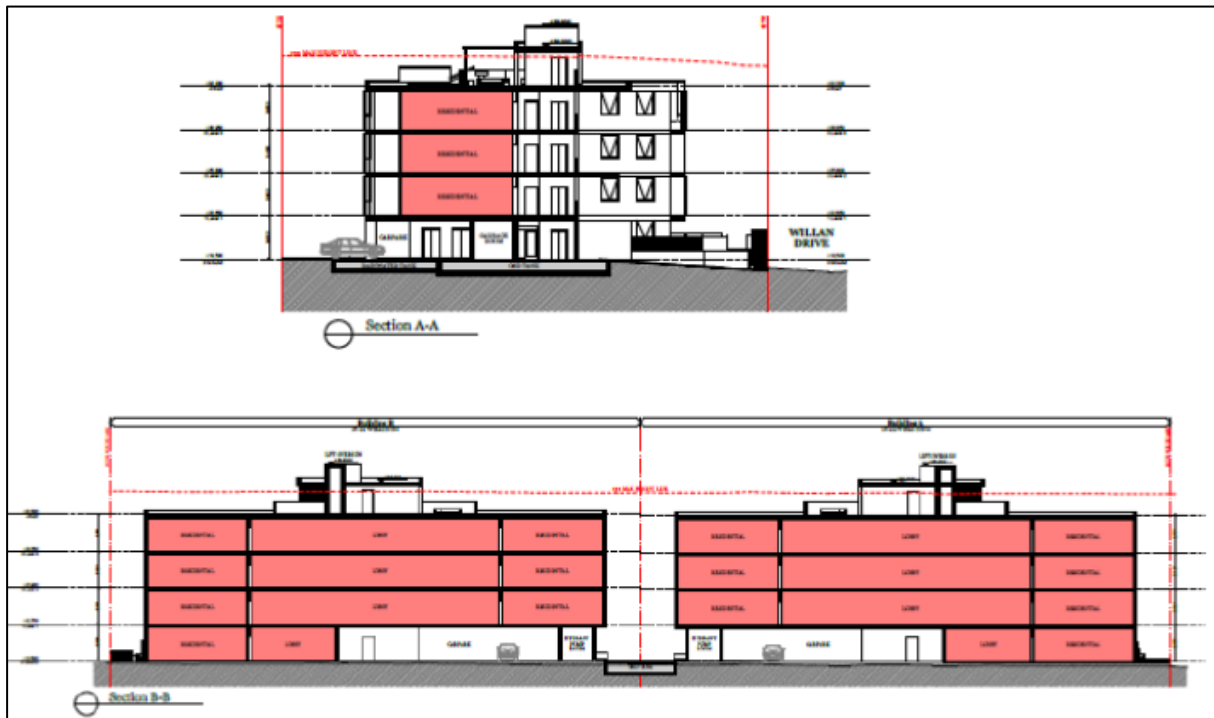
Extract of the section plan showing the building elements which exceed the height limit
